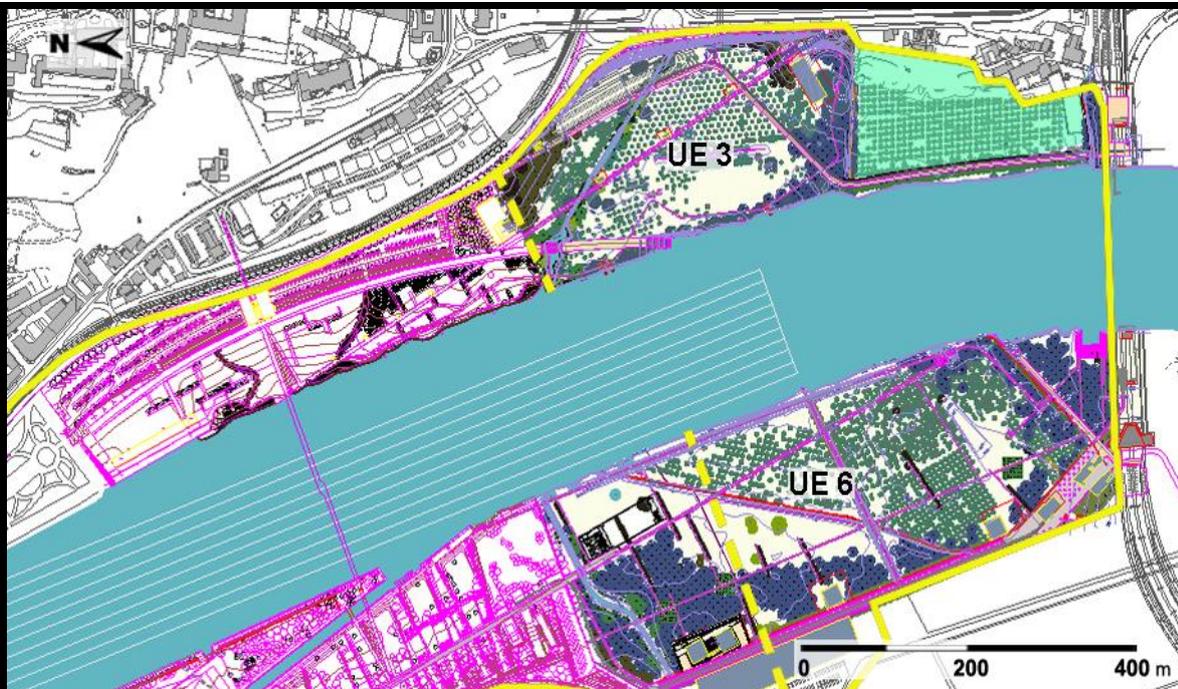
Site plan of the detailed project for two sections of the Parque Verde do Mondego
